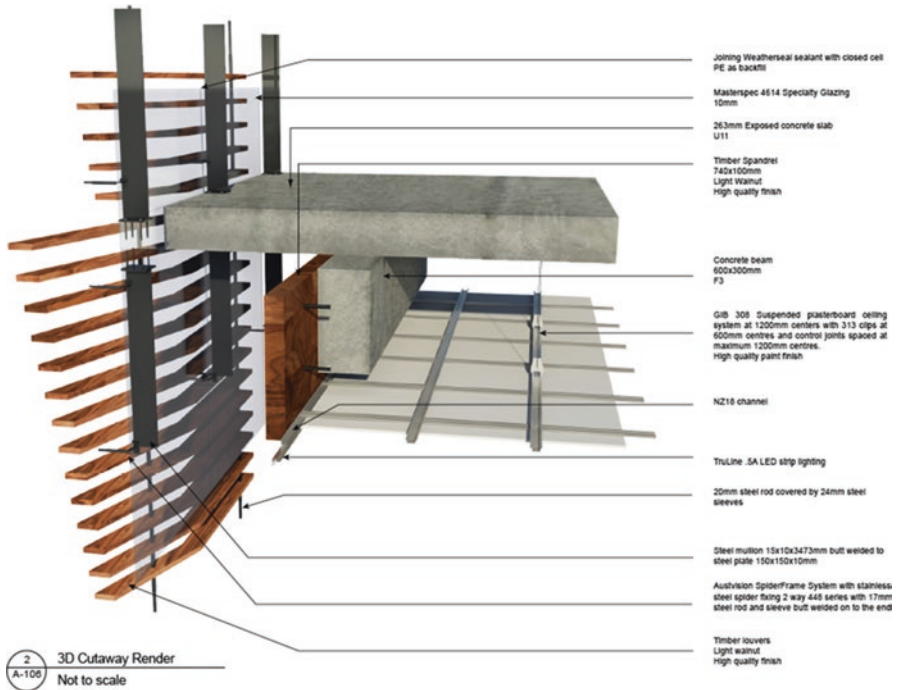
Sophia Borissenko, Façade design, 2015. 3D cutaway detail. (Image: Sophia Borissenko)
